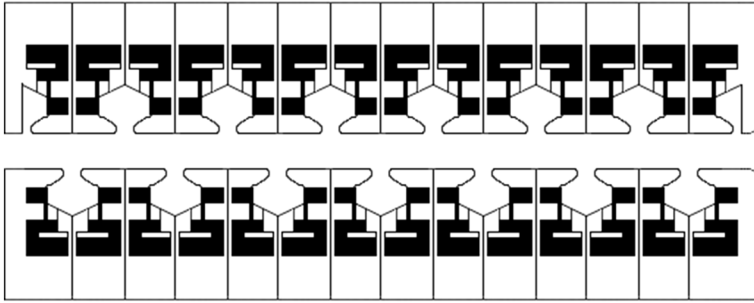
Site plan, Park Planned Homes, 1945–1947. Image: author
